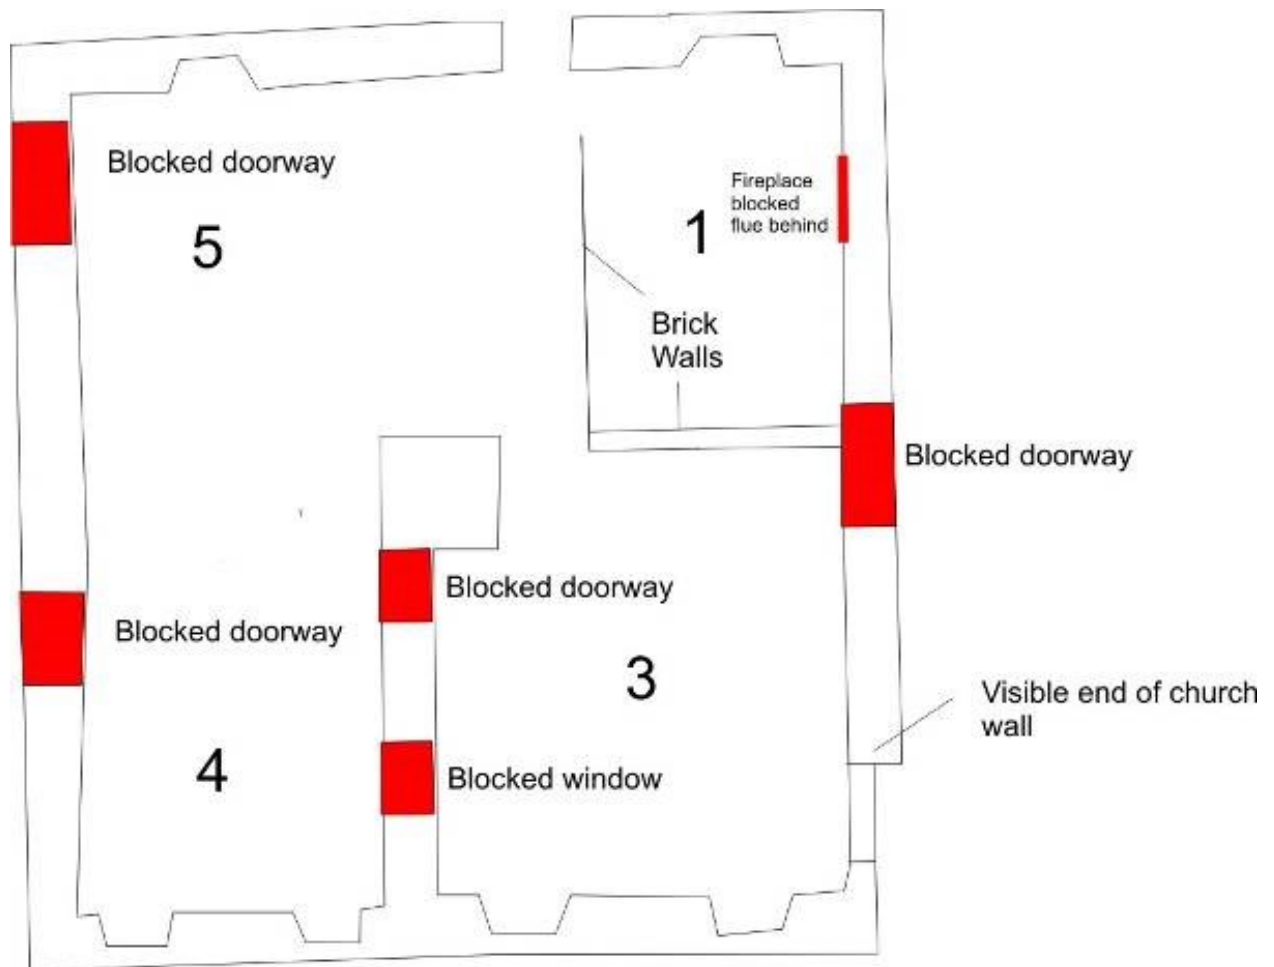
Plan of first floor level of 49G High Street showing all blocked doorways, blocked window, location of blocked flue and timber laced brick walls Scale 1:50
